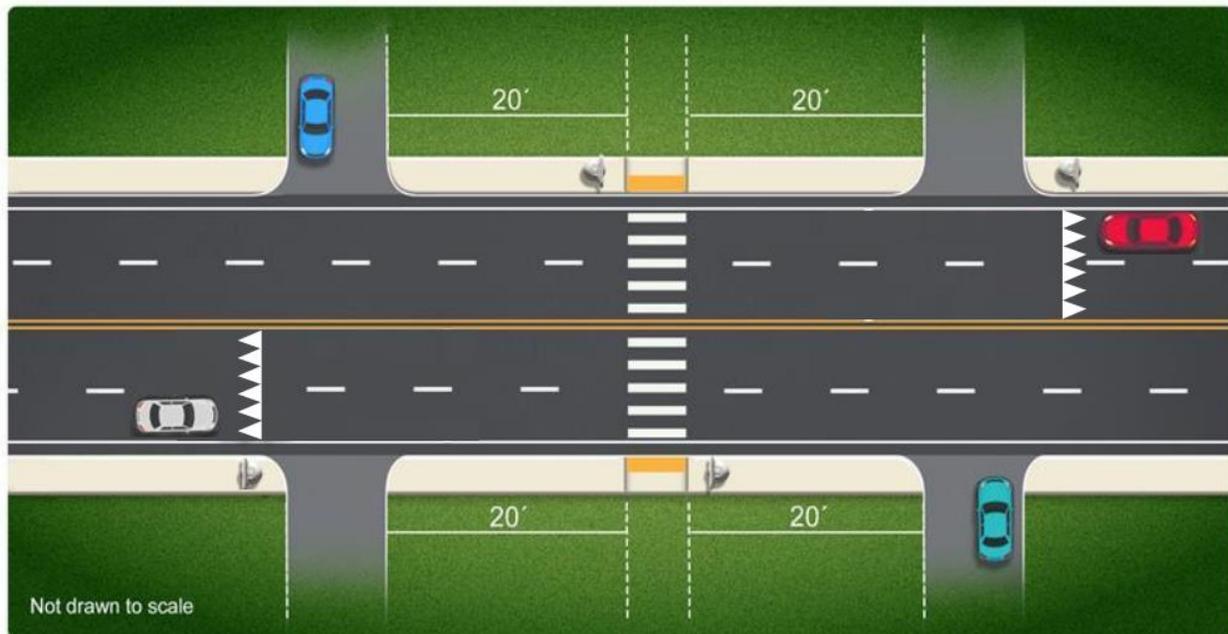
Driveway Spacing from Rectangular Rapid Flashing Beacon
